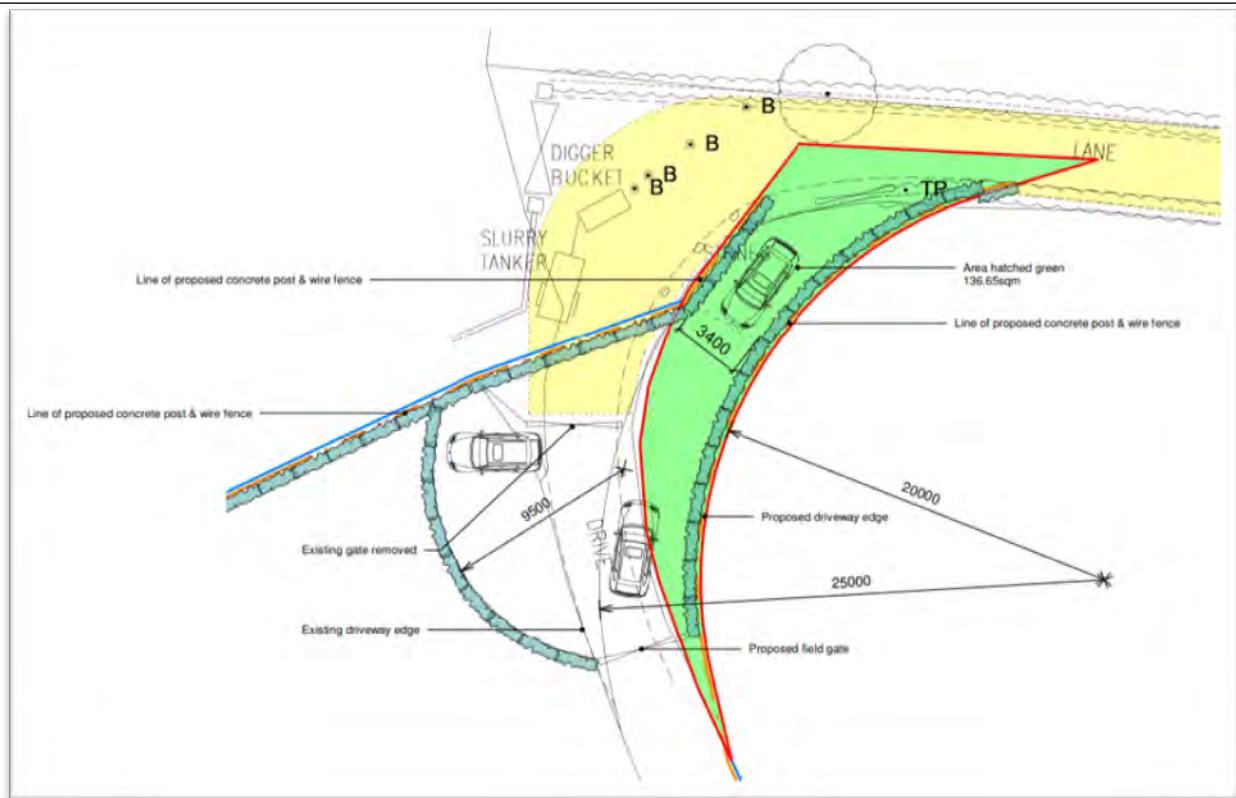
Proposed access shown in green, replacing the existing access arrangement
